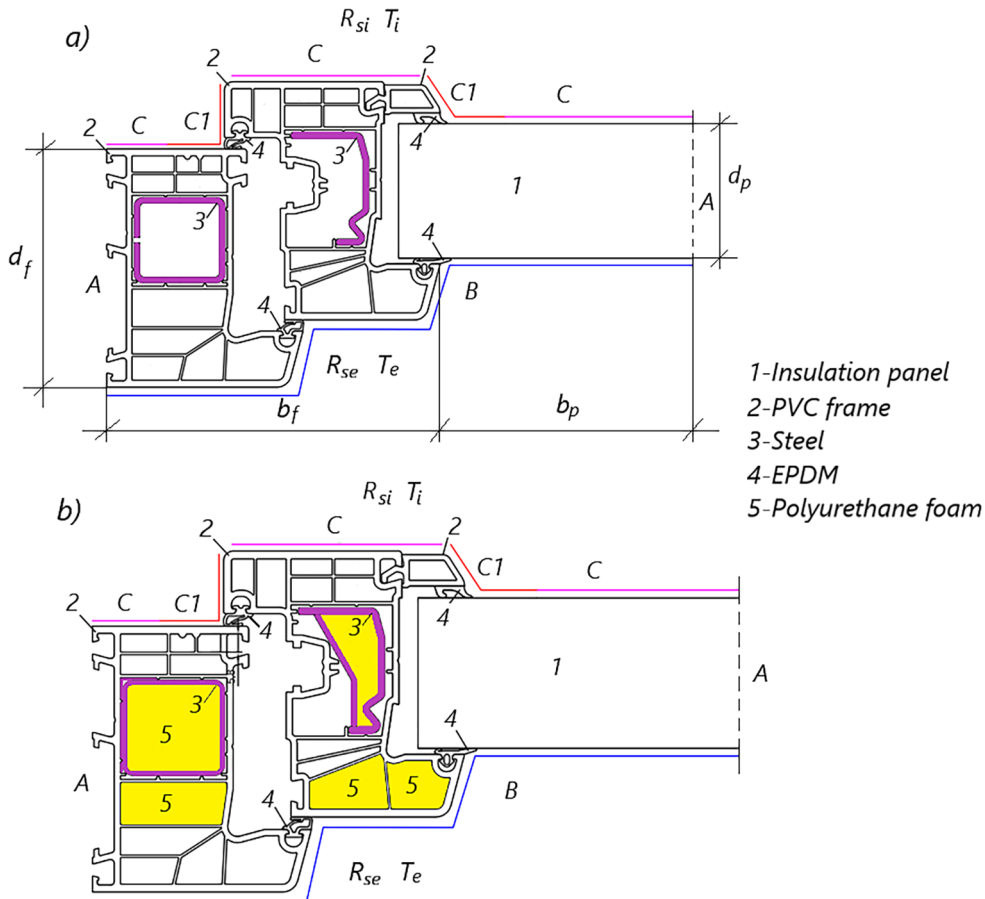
Window frame with insulation panel-boundary conditions: a) PVC frame with open steel profile; b) PVC frame with closed steel profile and insulation
